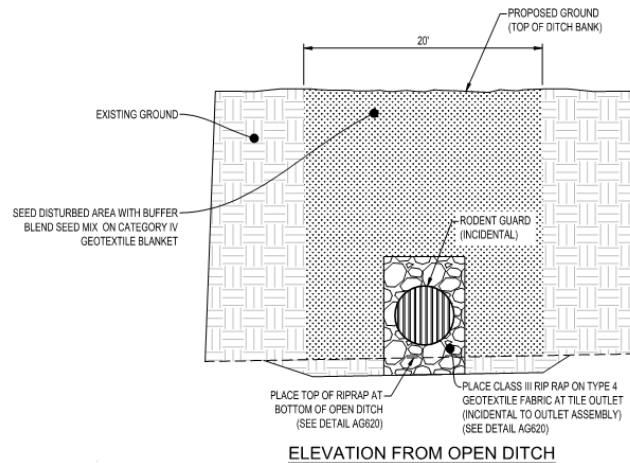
Typical Alternative Side Inlet (ASI) Detail (Not to Scale)
